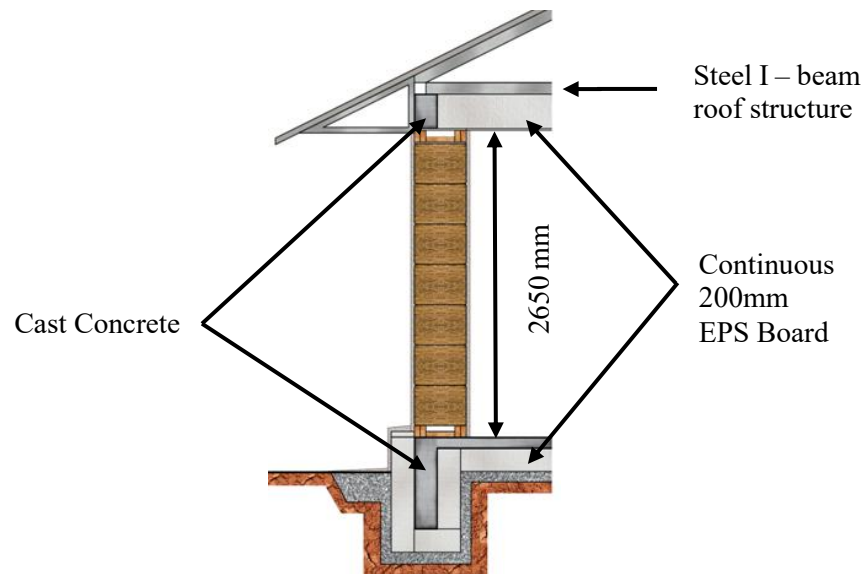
Flat laid bale wall construction of the experimental straw bale house.
